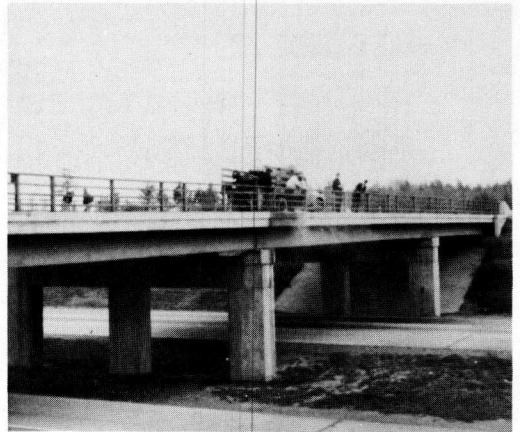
Treating fascia and pier facings of Schenectady Interchange bridge, November 16, 1956.
